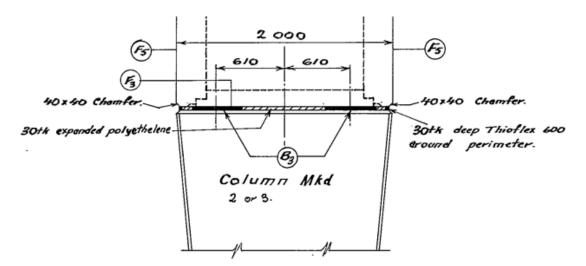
Intermediate Pier (Extract from Record Drawing ER6D/S73/1)
